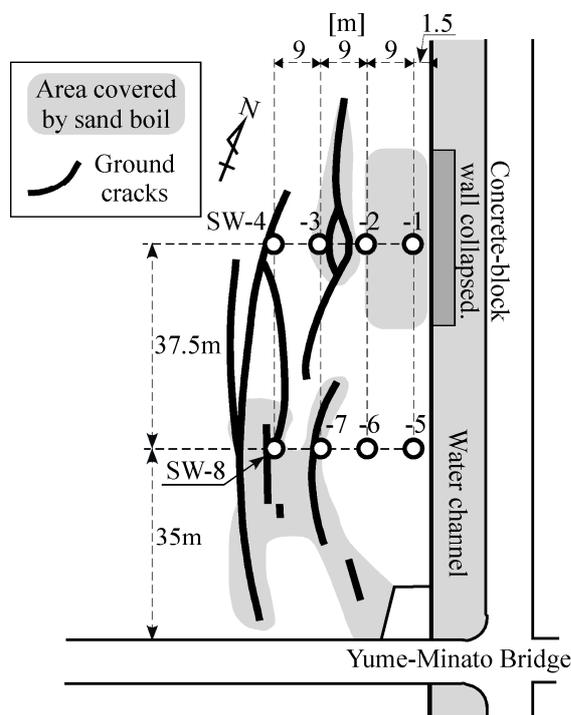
Details of ground cracks and erupted subsurface silt at west side of water channel
